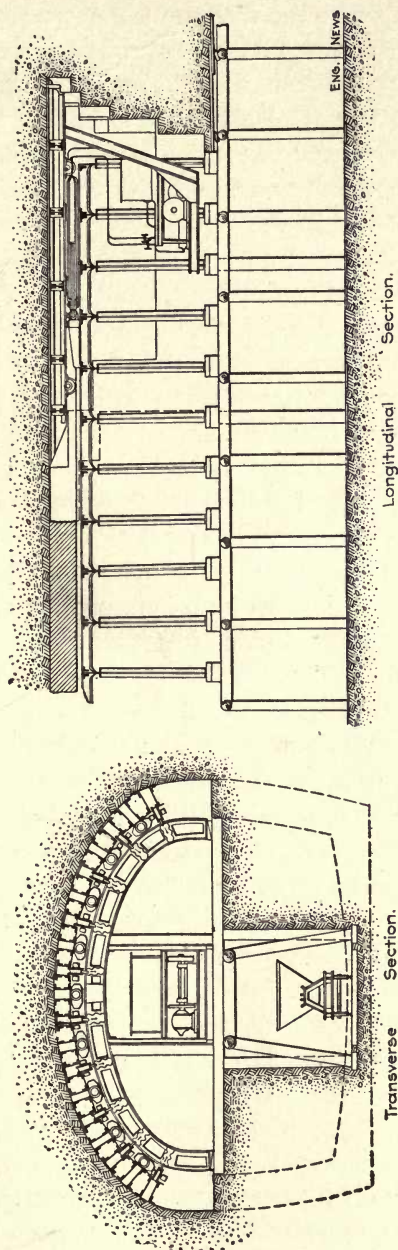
Cross and Longitudinal Section of the New Shield Used on the Paris Metropolitan Tunnel.
